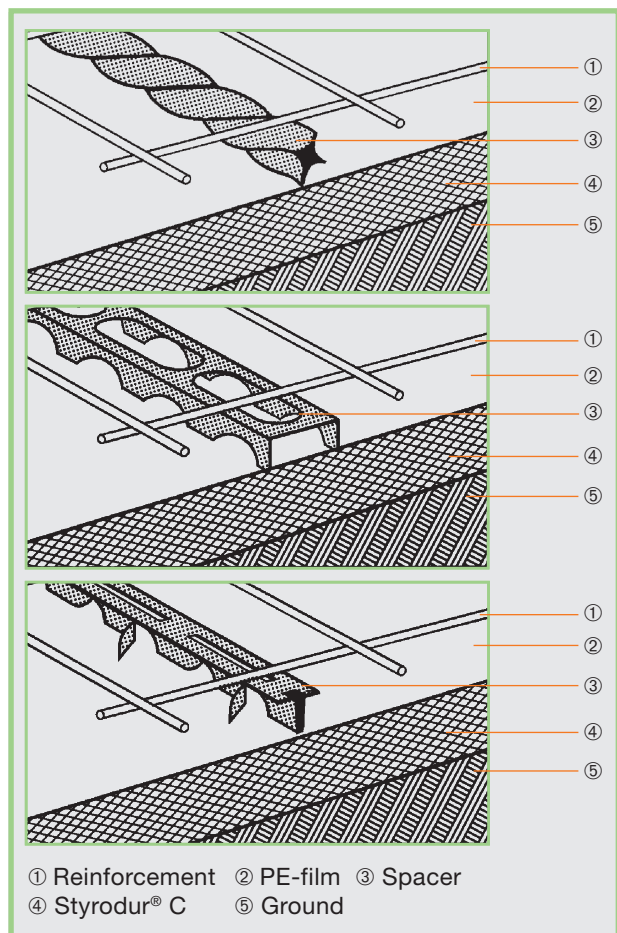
Walkable plastic spacer for horizontal reinforcement. The height of the concrete cover is predetermined by the profile height.
